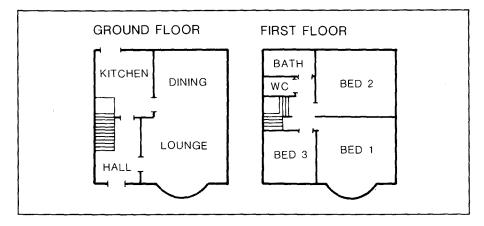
Universal plan: typical floorplan (for detached or semi-detached house) (source: redrawn from contemporary publicity material)
